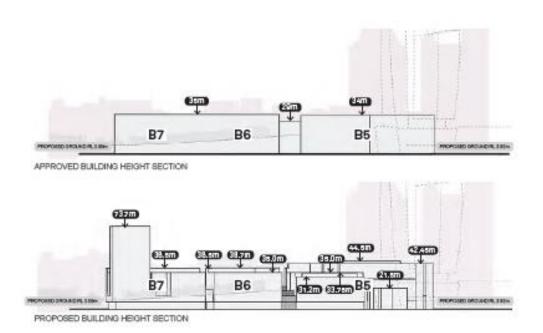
Applicants urban design analysis of the height sections approved under the current Concept Plan and proposed height section by MOD 9 (Source: Urban Design Report prepared by Hassell December 2021)
